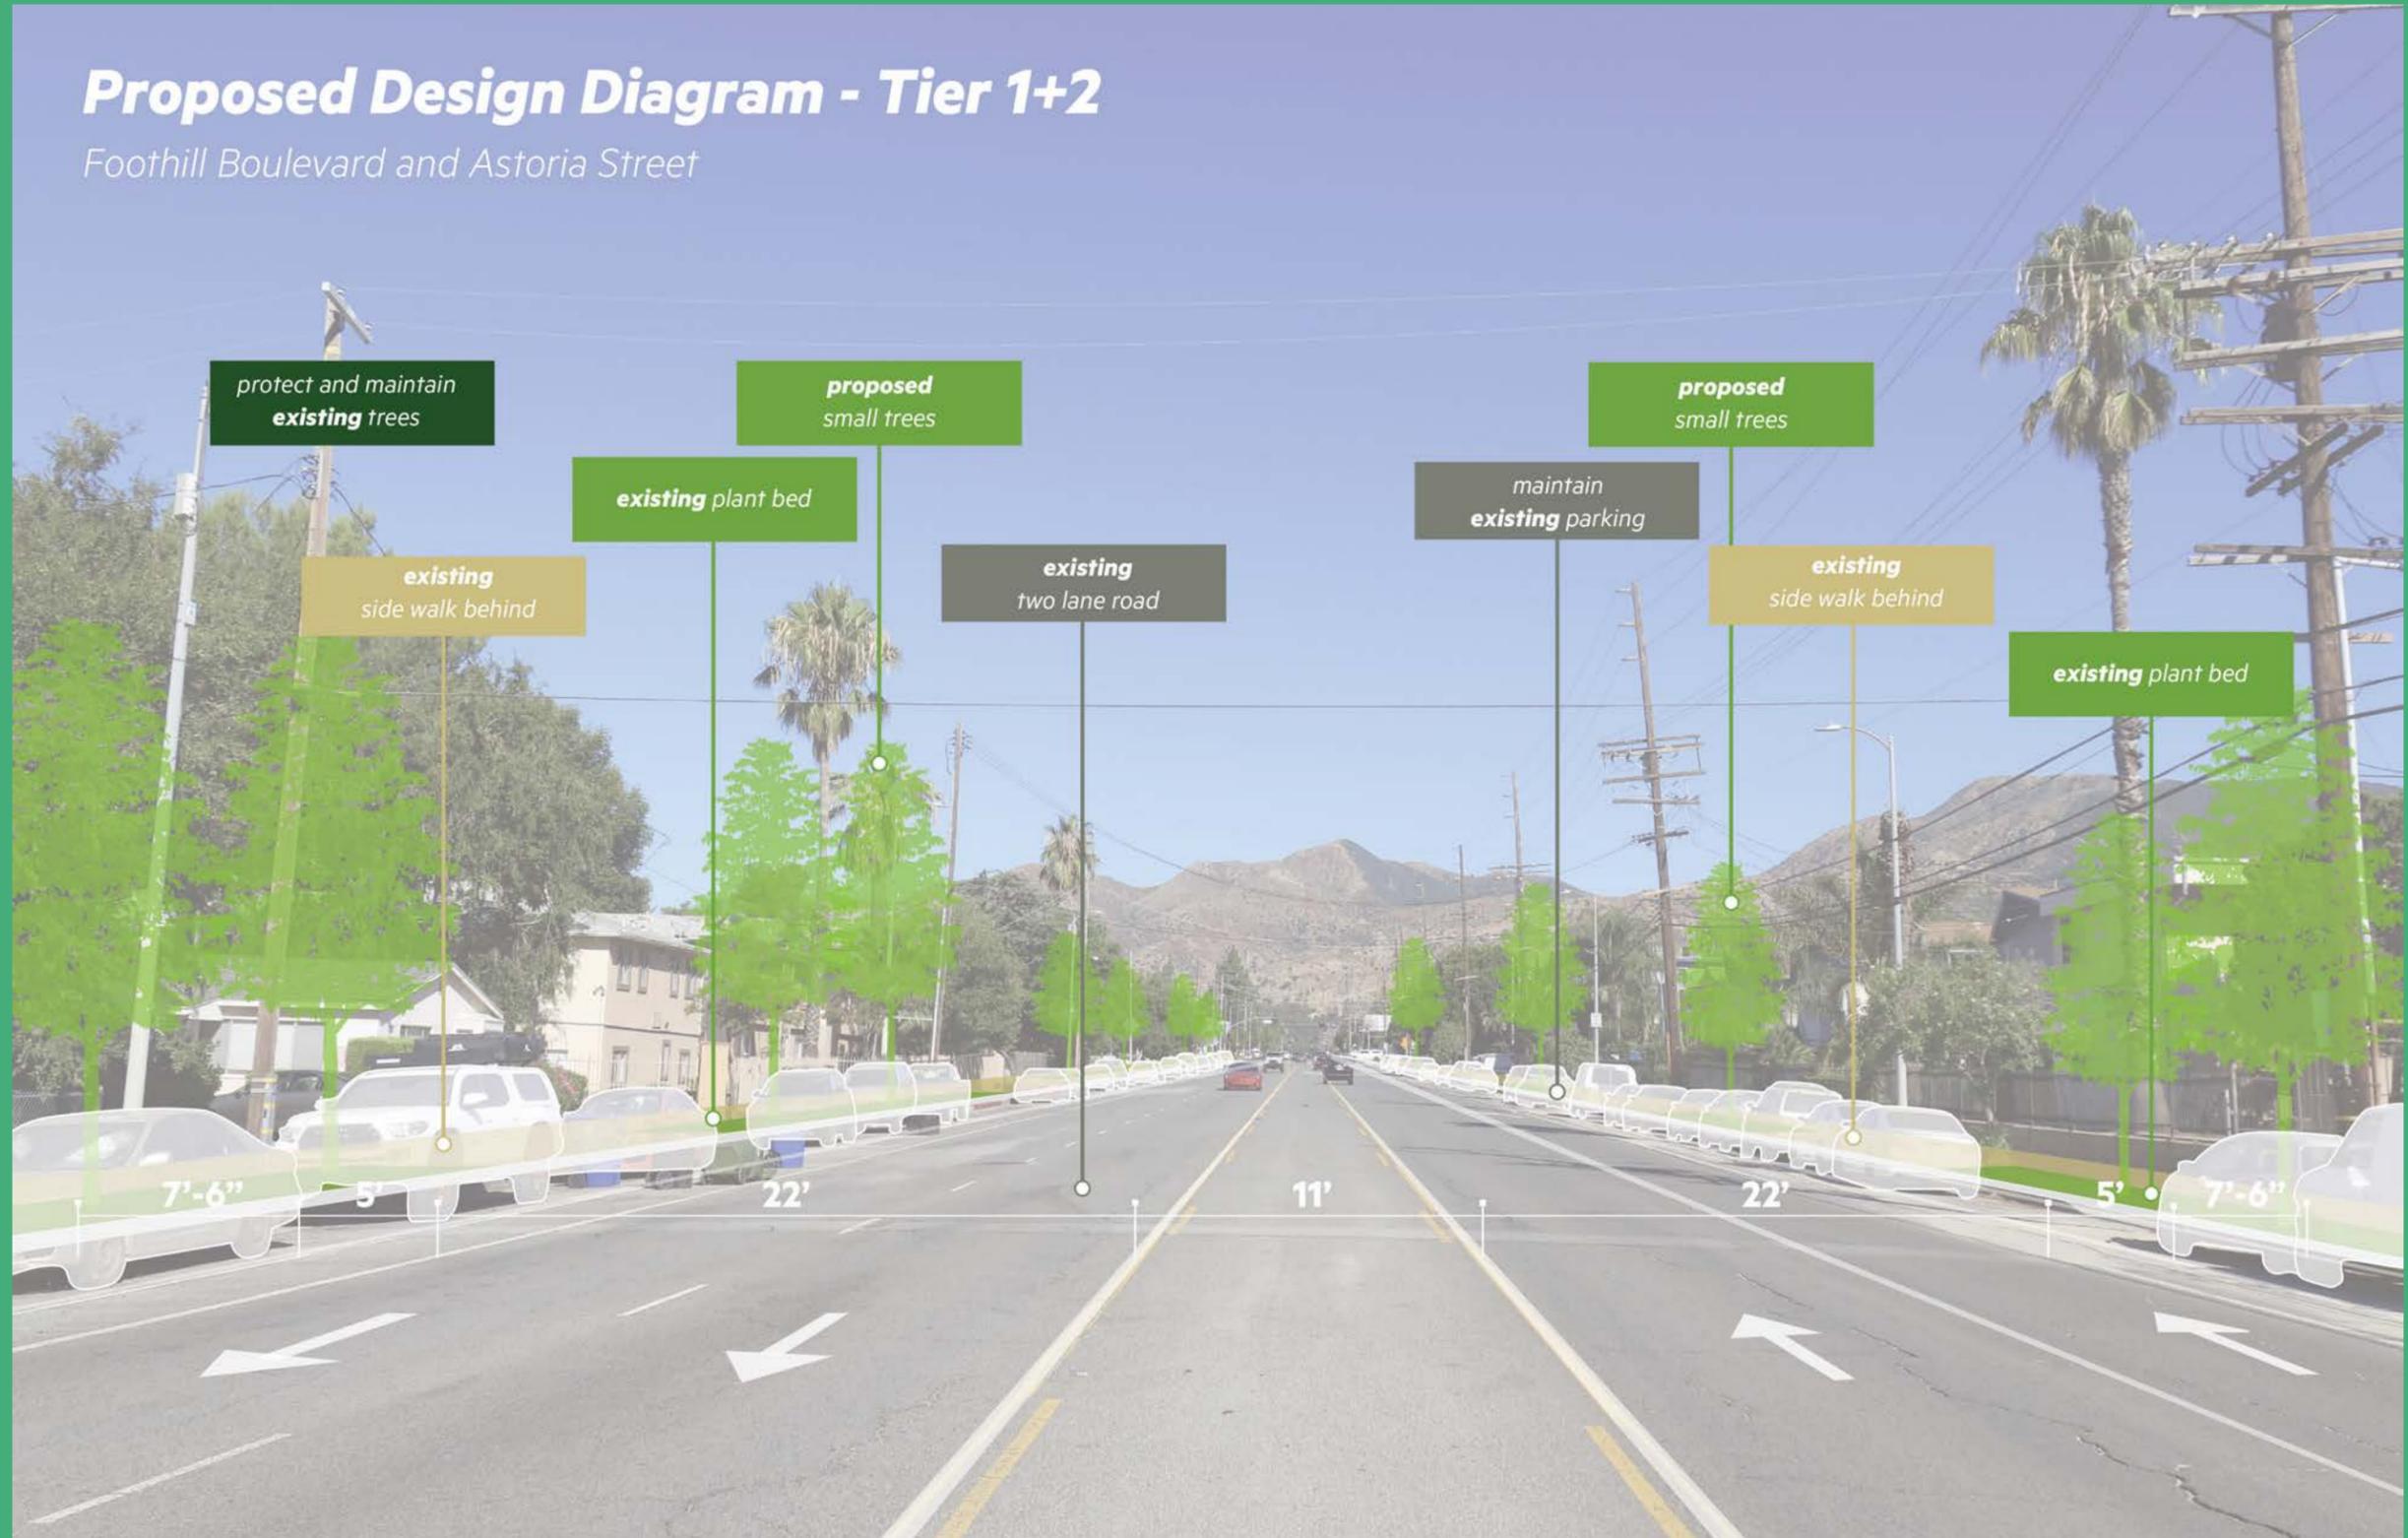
Foothill Boulevard and Astoria Street, proposed design diagram, Tier 1 and Tier 2
